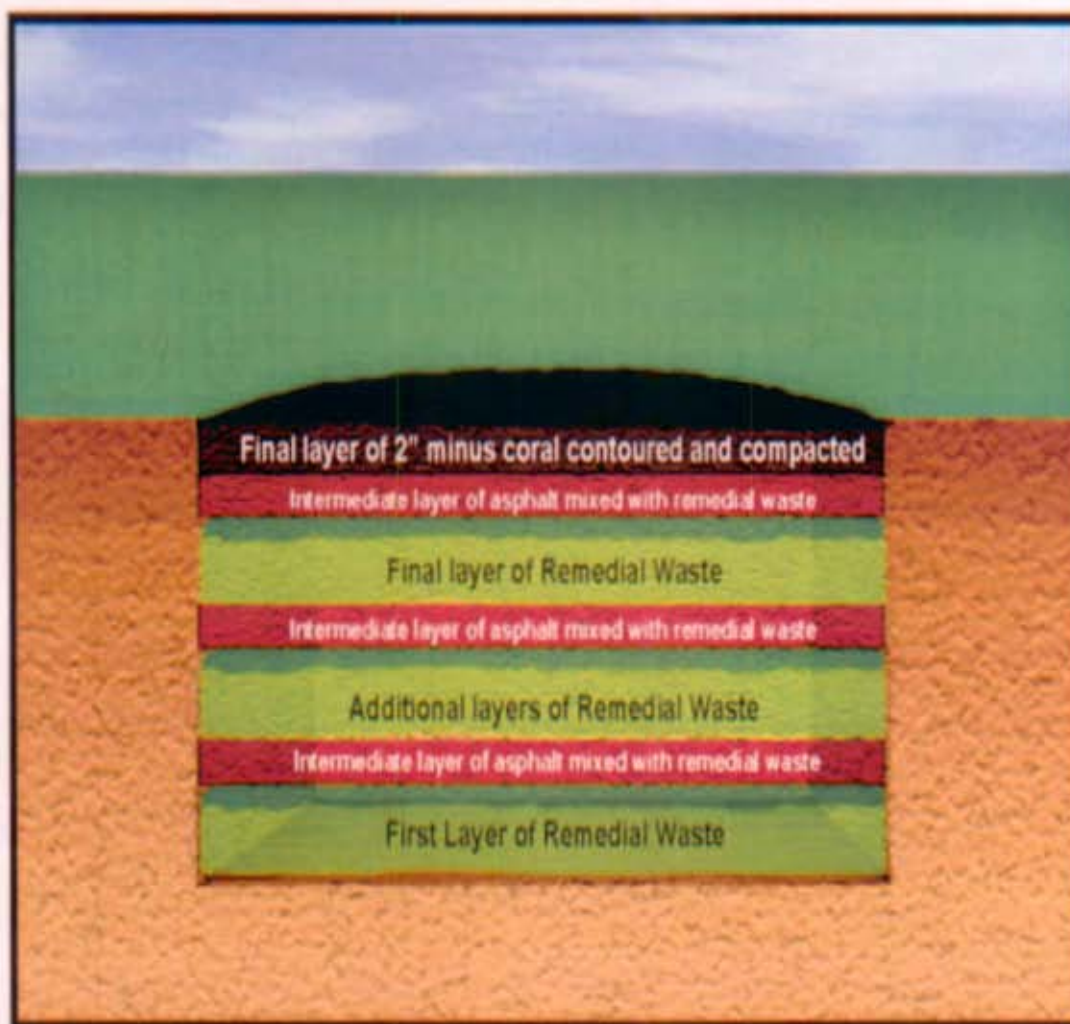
is a typical cross-section through a trench filling operation. The areas between the existing trenches in LF-2 will be excavated to a depth of 10 feet and filled with remedial waste material from IRP sites. The remedial waste material will fill the trench to within a couple feet of the surface so that the asphalt/dirt cover and the final coral cover can be added and compacted. The final contour of the trenches will direct drainage away from the buried material.
